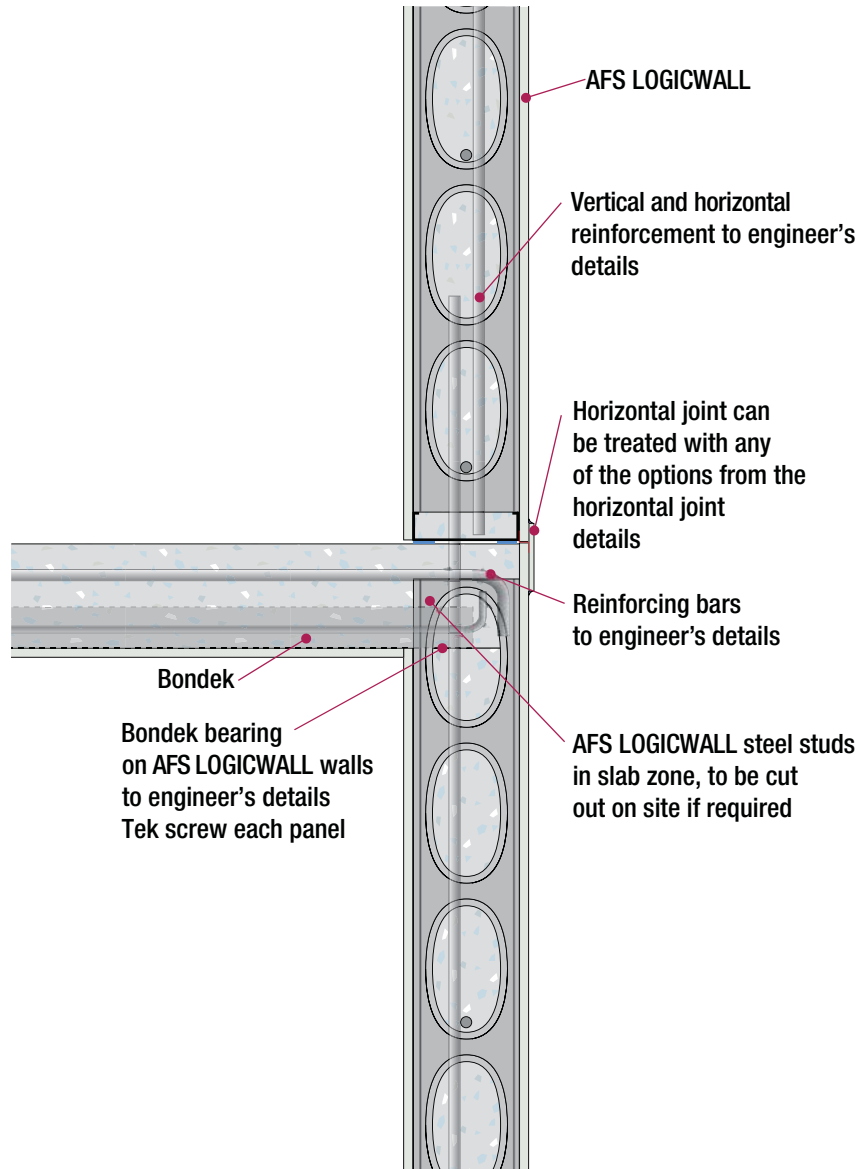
Permanent Formwork, Junction To Internal AFS Logicwall® (i.e. Bondek or similar metal floor system)
